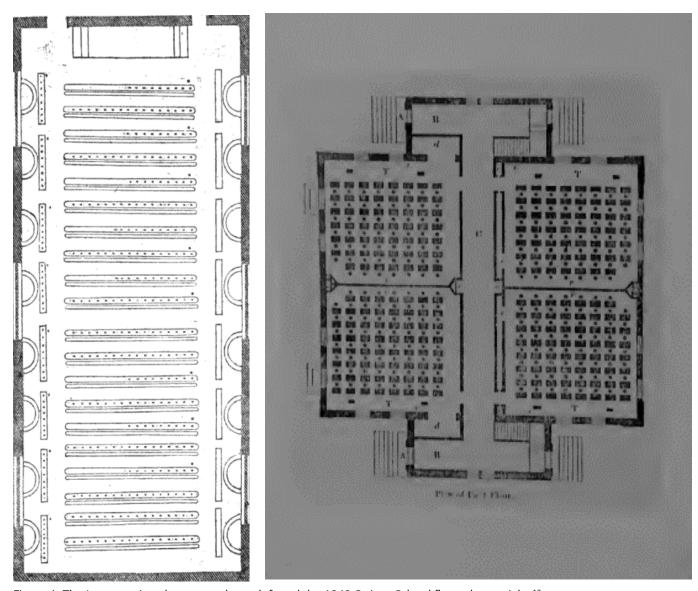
The Lancasterian classroom plan at left and the 1848 Quincy School floor plan at right. 12
